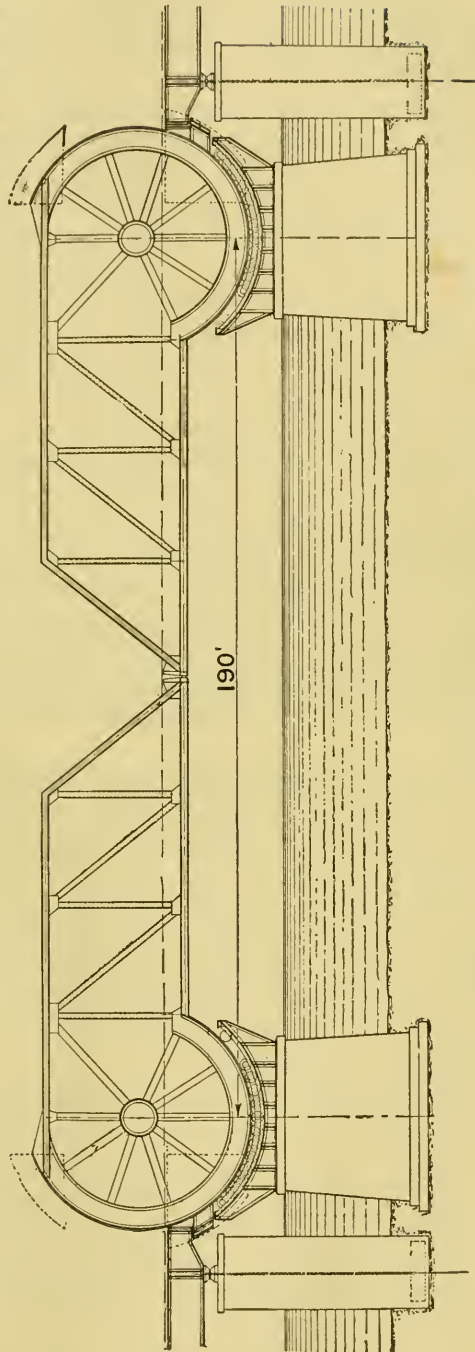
Proposed Roller-bearing Bascule Bridge over the Chicago Drainage Canal.
